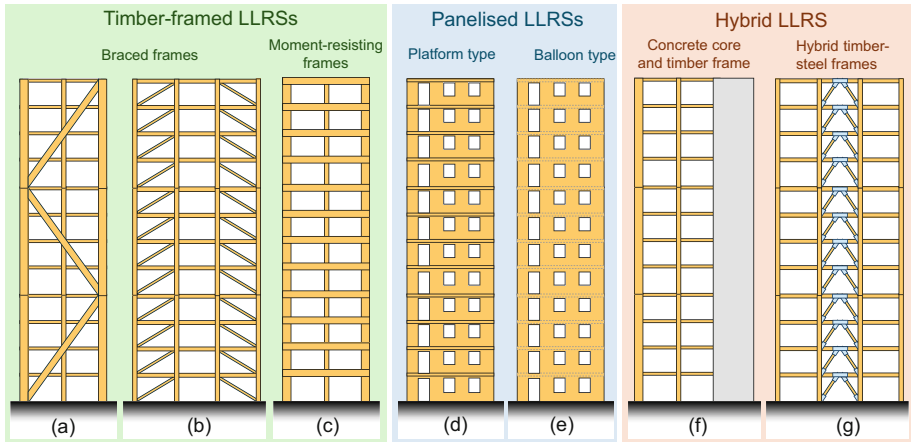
Examples of LLRS for taller timber buildings based on: 1D elements, such as braced frames (a, b) or moment-resisting frames (c); 2D elements, such as platform-type (d) or balloon-type (e) CLT structures; hybrid systems involving concrete (f) or steel (g) elements.
